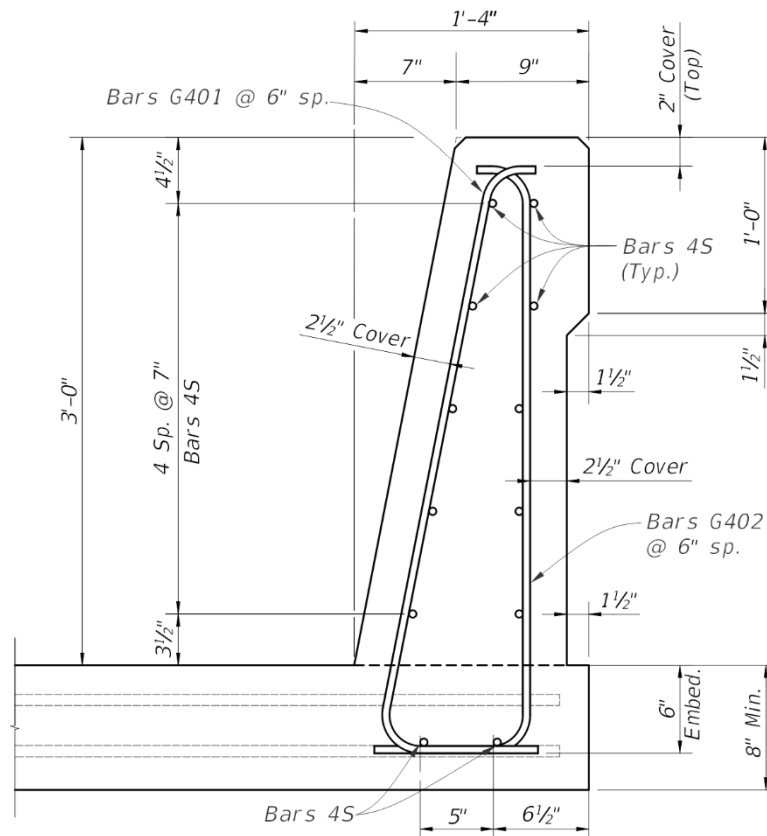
GFRP reinforced typical section through traffic rail (COR)
